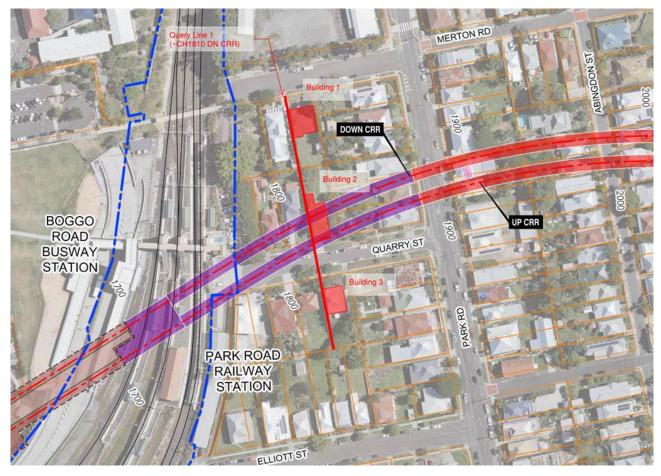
Tunnel alignment and query line location in low cover area immediately north of Park Road Railway Station
